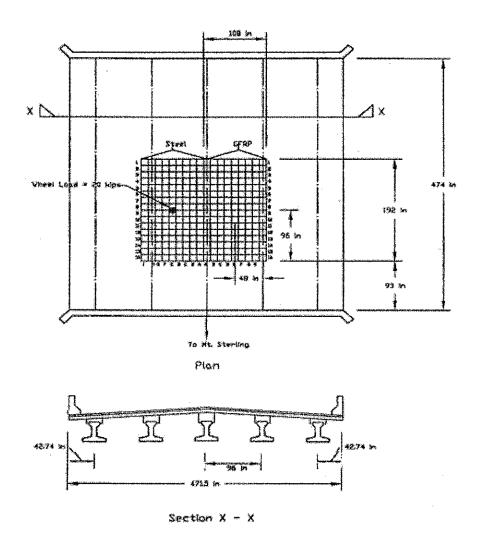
Location of Steel Reinforced Grids on the Bridge
